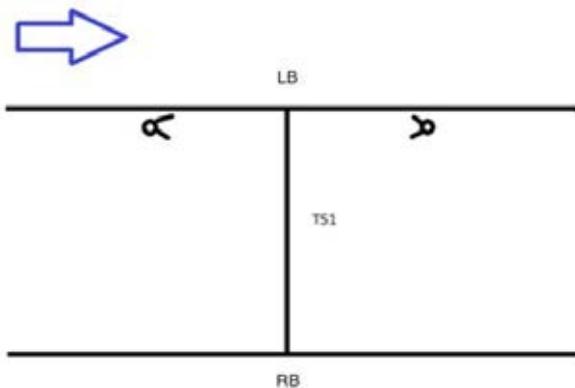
Site plan for Tidal Crane Barrier 5
